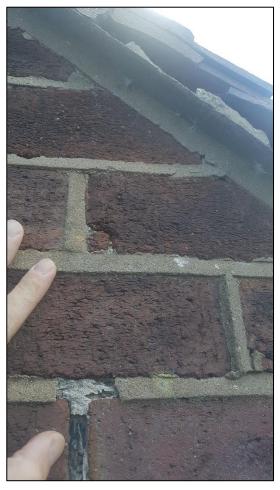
The walls of the building were in good condition and offered no roosting potential and showed no signs of bat activity.
